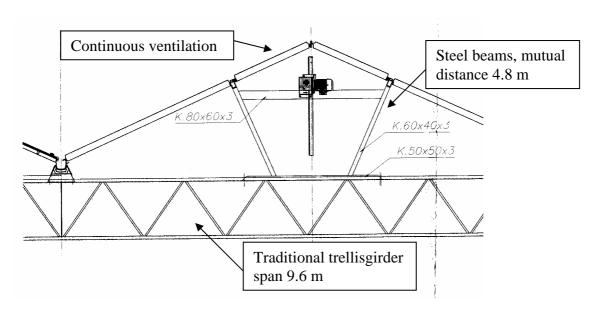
The roof structure of the Florida greenhouse covered with zigzag-sheets, which are carried by beams in triangle shape and purlins.
